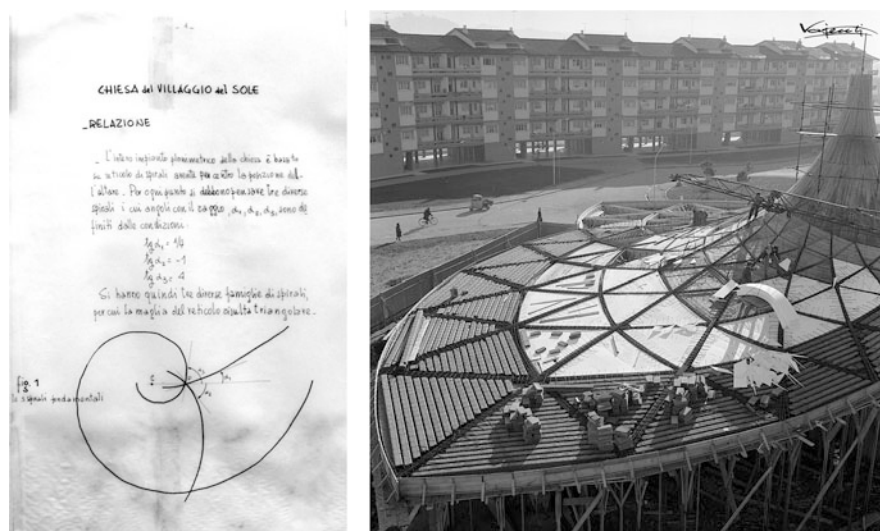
The roofing of the San Carlo Church, Villaggio del Sole, Vicenza, S. Musmeci, S. Ortolani, 1960–1962: (left) Calculation report, 1960. Courtesy MAXXI Architecture Archive; (right) The construction site, 1961, Vajenti Photo (SIXXIdata)
